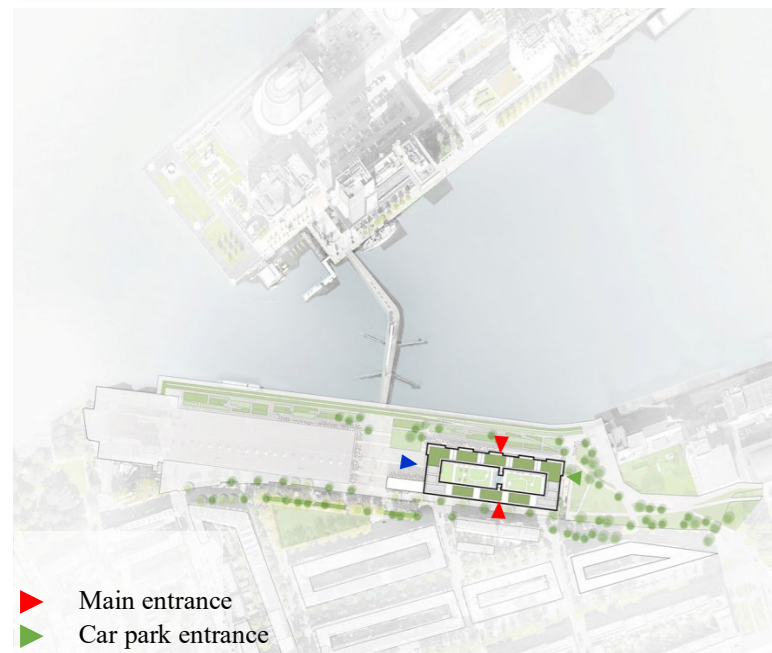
Site plan/ source: ArchDaily.com edited by the author
